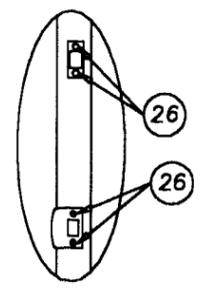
DETAIL "F" WINDJAMBER ASTRAGAL AT SILL
